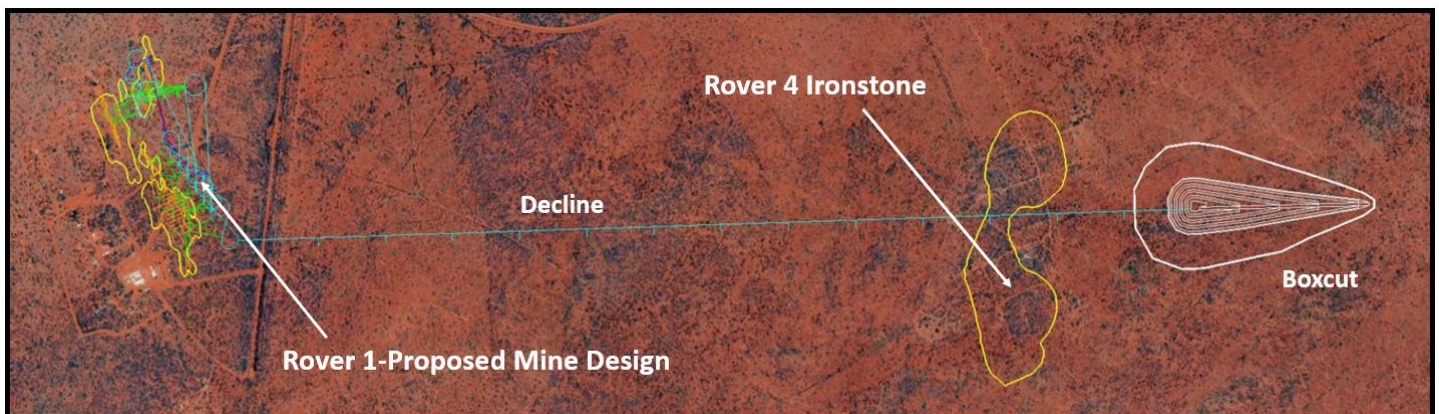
Plan View of Rover 1 Proposed Engineering Design with Rover 4 Location
